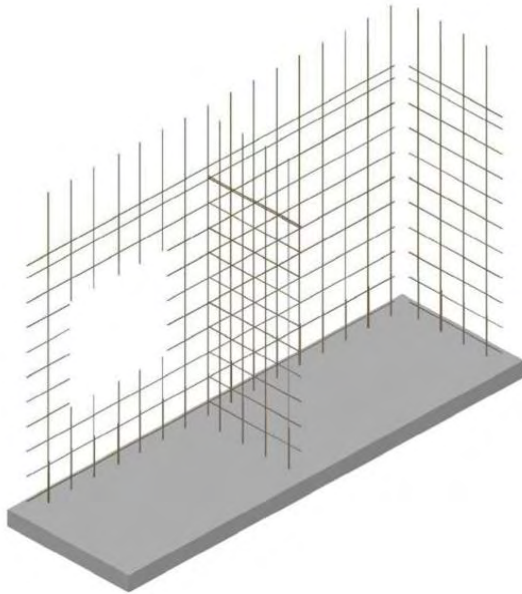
Horizontal reinforcement bars      Fig. 39 Vertical reinforcement bars
